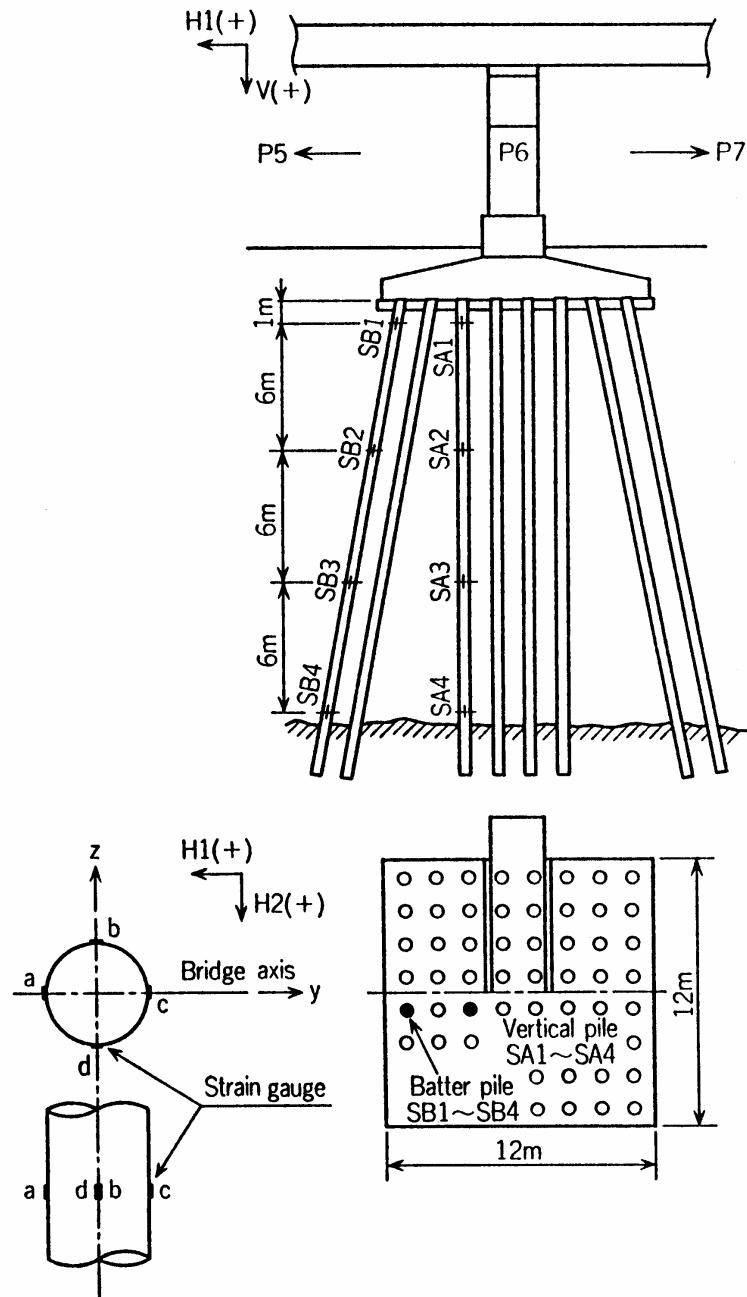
Configuration of the Pile Foundation at Pier 6 and Locations of Strain Gauges [after Ohira et al. (1984)].
